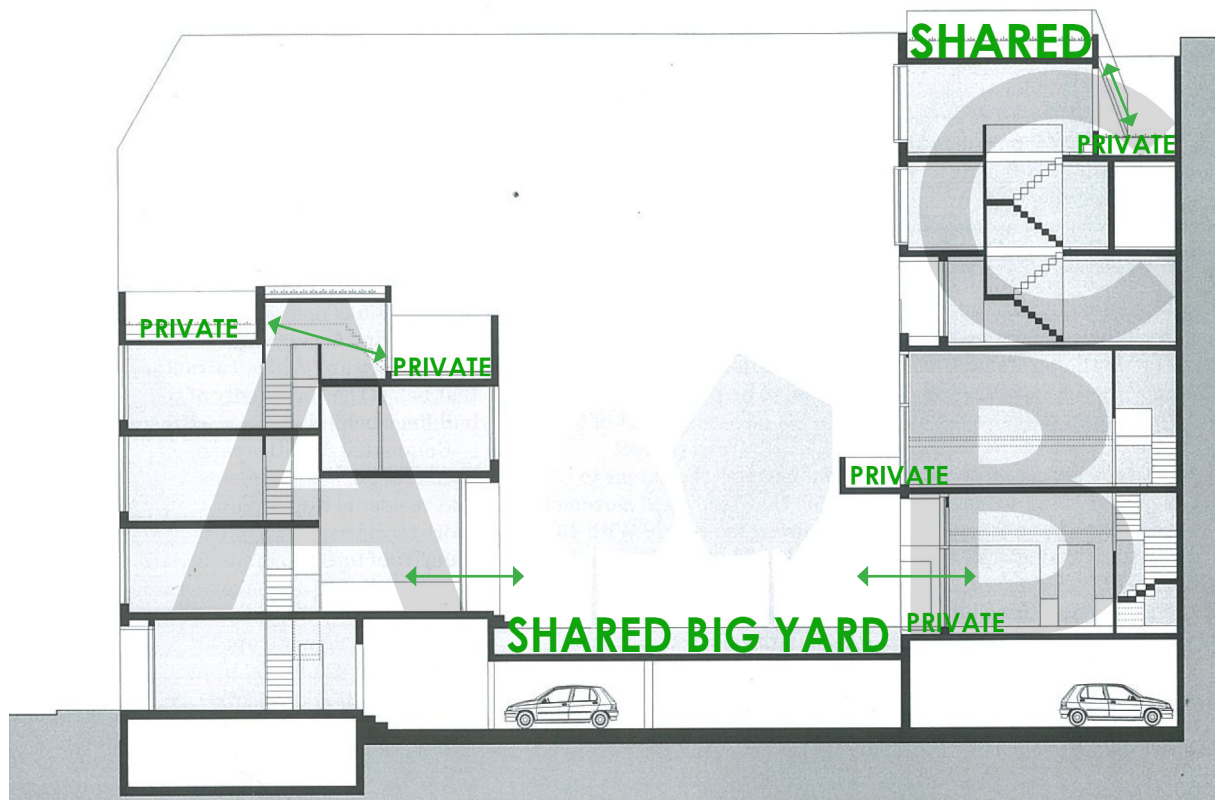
| BIGyard Project Section highlighting the connection between public and private outdoor space for each typology.
